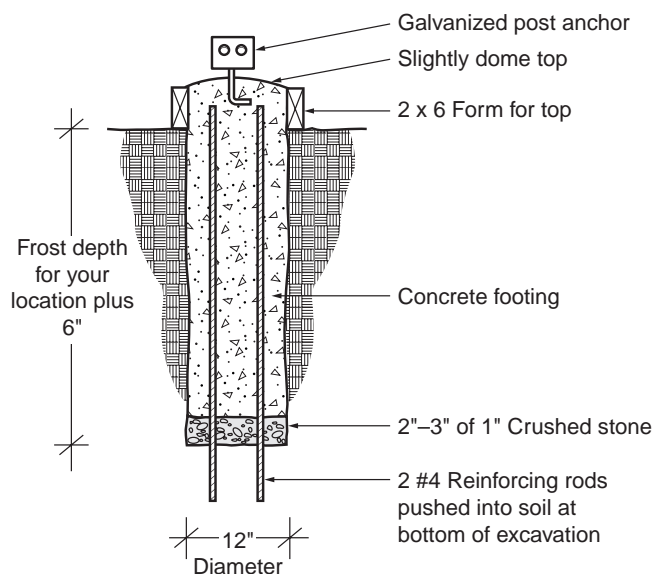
Using a box form to shape the top of a concrete footing pour.
